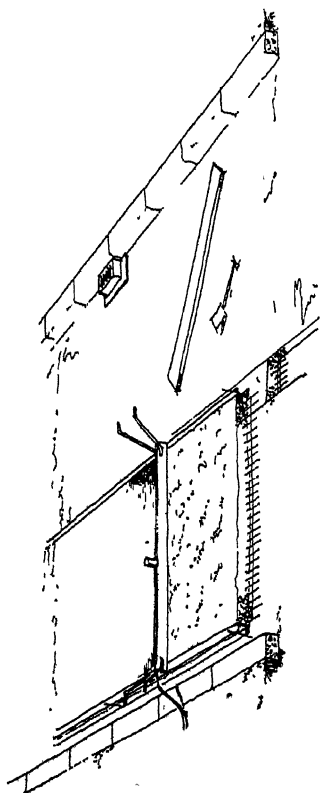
HAND TAMPER FOR TAMPING BETWEEN TWO FORMS.
